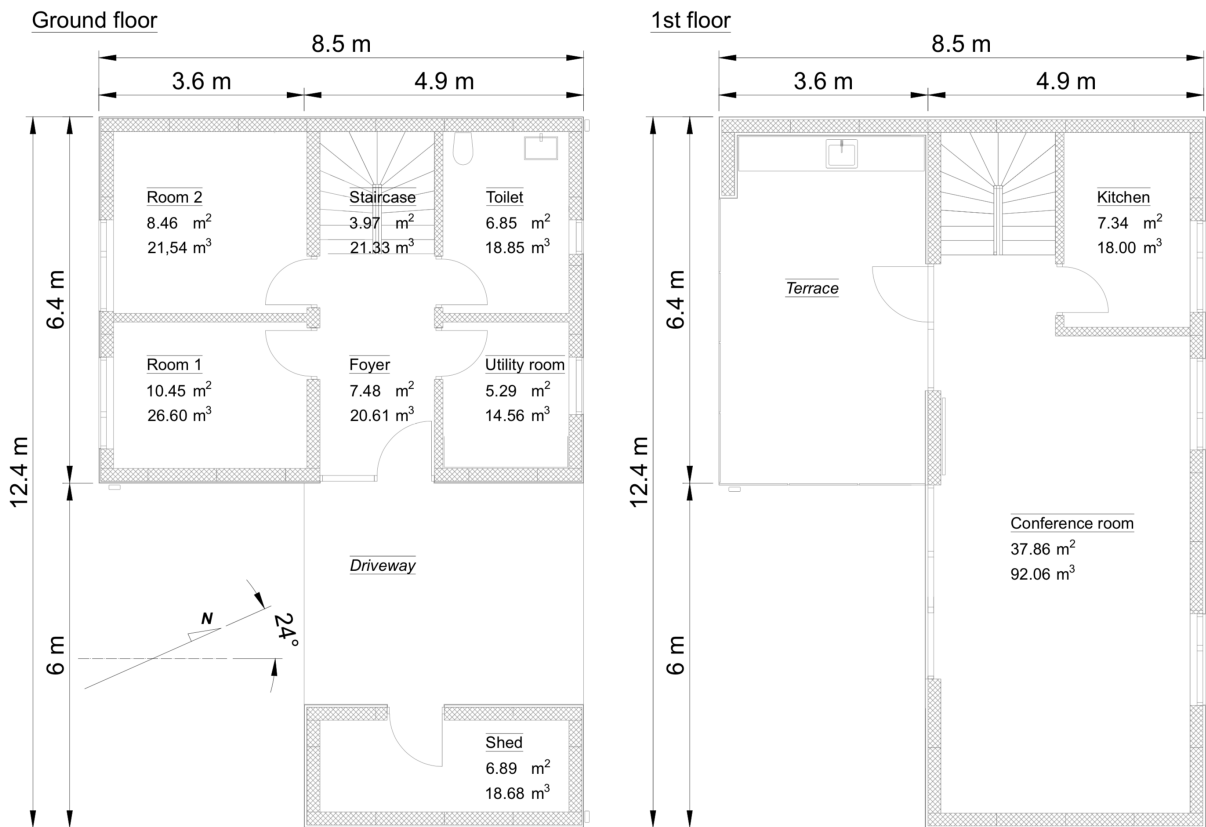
Test house floor plans - net floor areas and net room volumes.
